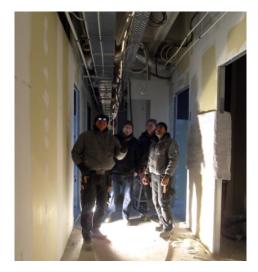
INSITER HoloLens BIM-based Mixed Reality App - On-Site Demonstration with construction workers
